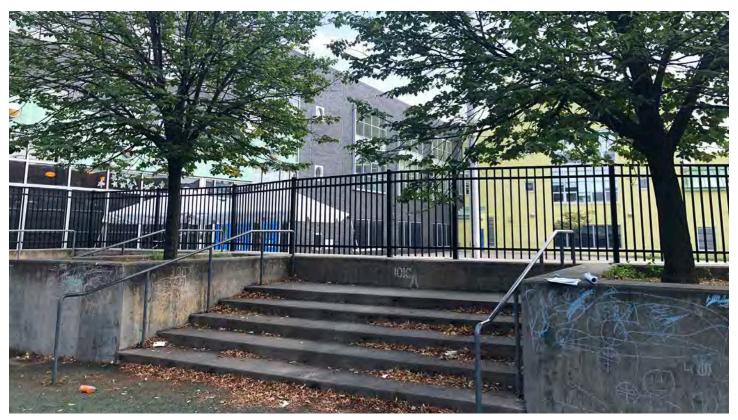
Existing Raised Planters & Concrete Steps to be Removed; Location of Proposed Outdoor Classroom Platform
